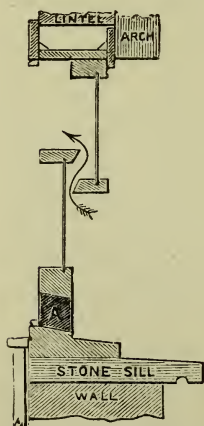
Hinckes Bird's Plan of Window Ventilation.
